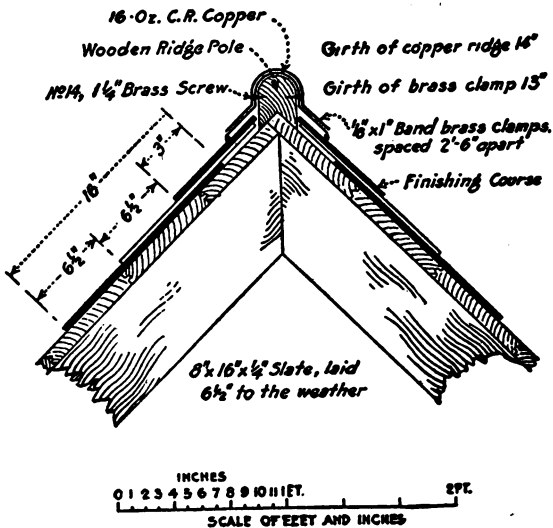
Detail of Copper Ridge Over Slate Roof
